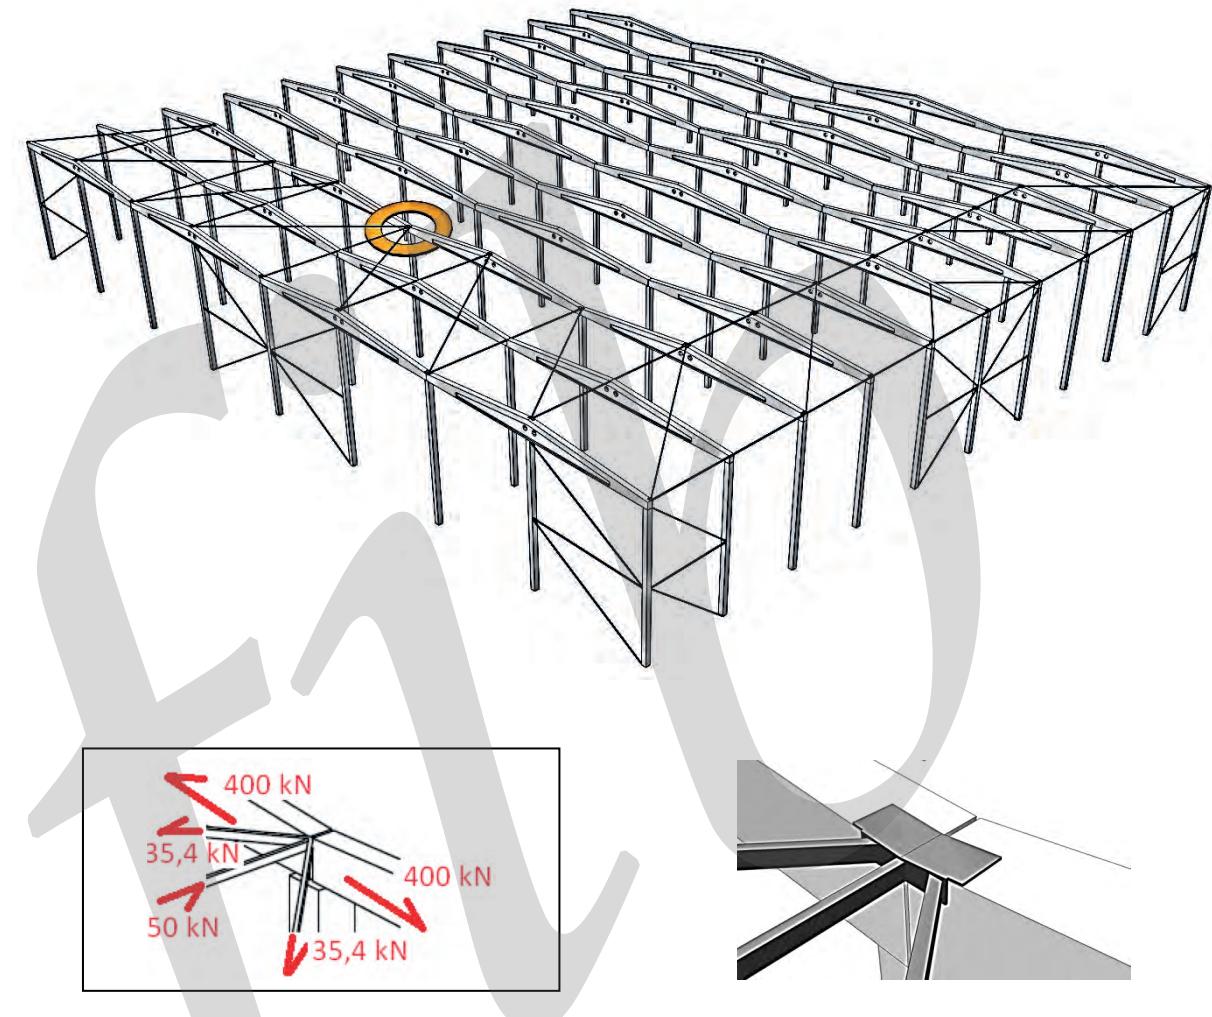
Example of diagonal bracing of roof and / or façade structures in a portal frame hall, and corresponding connection forces and detailing in the bracing profiles with the roof girders
